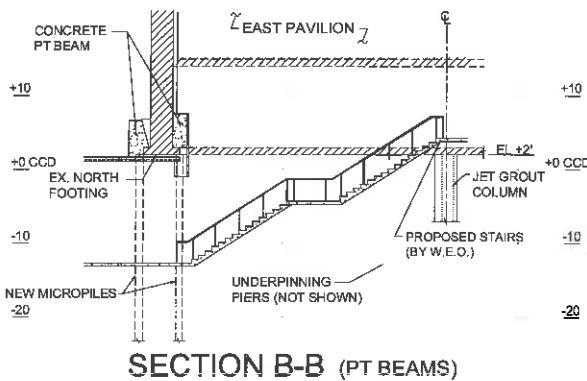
East Pavilion - PT Beam Section (from Figure 5)
